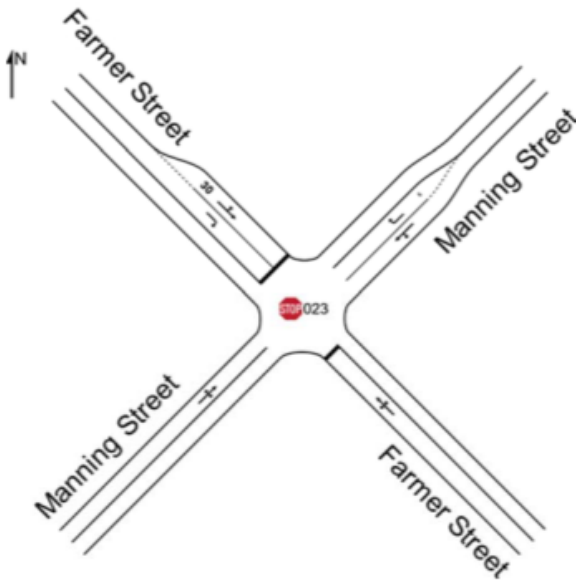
Farmer Street Lane Duplication SIDRA Layout
